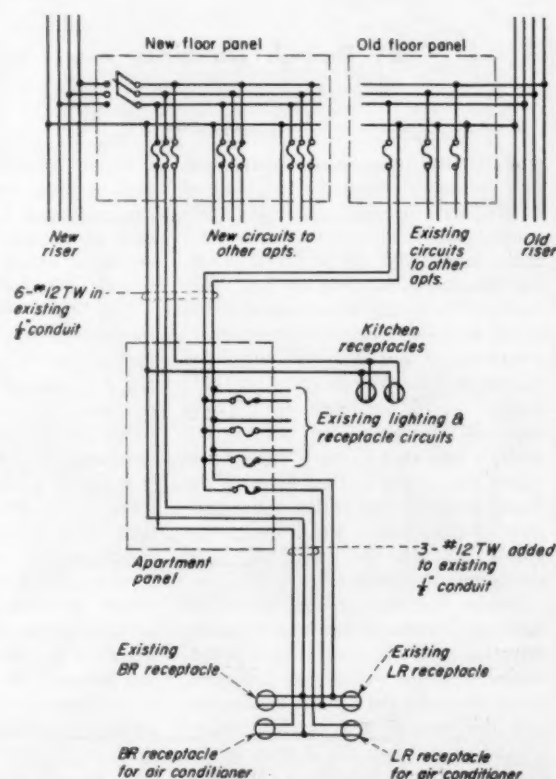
Diagram of typical floor wiring shows how existing conduit is being used for new circuits.
